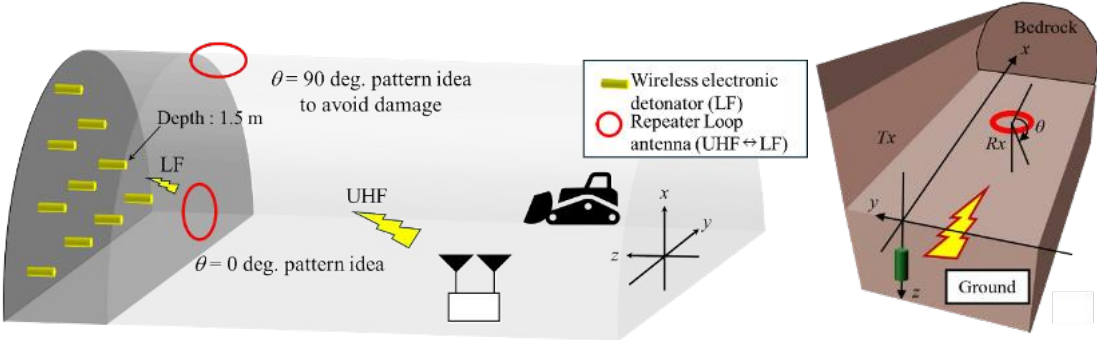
LF-Band underground communication experiment at a tunnel construction site.
